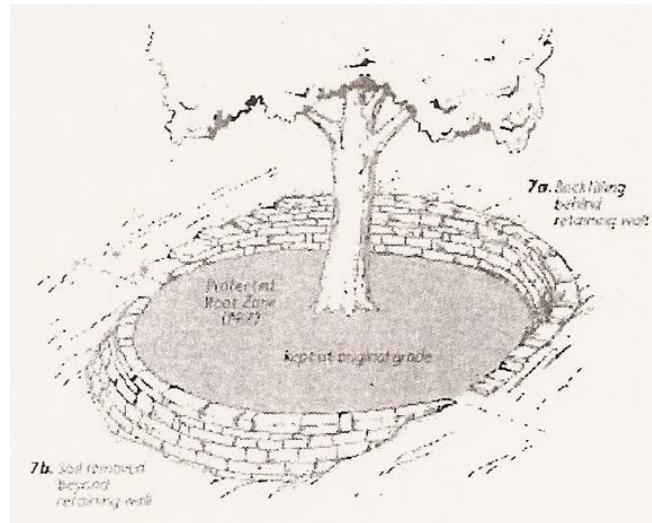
Using retaining walls when natural grade must be raised or lowered.
